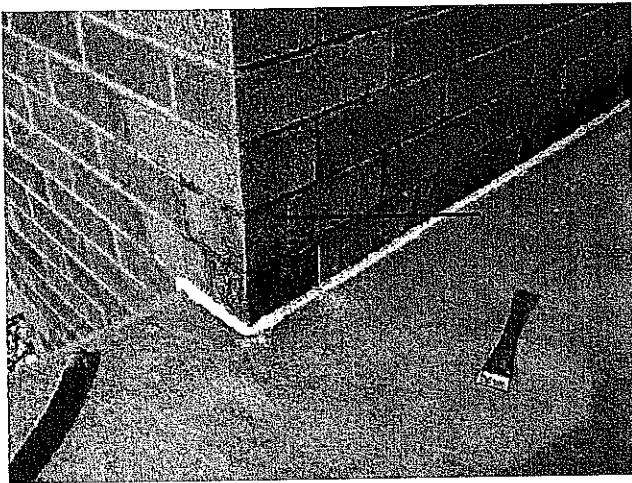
Previous sealant repair above suite 2201. Red arrow shows weak joint location.
